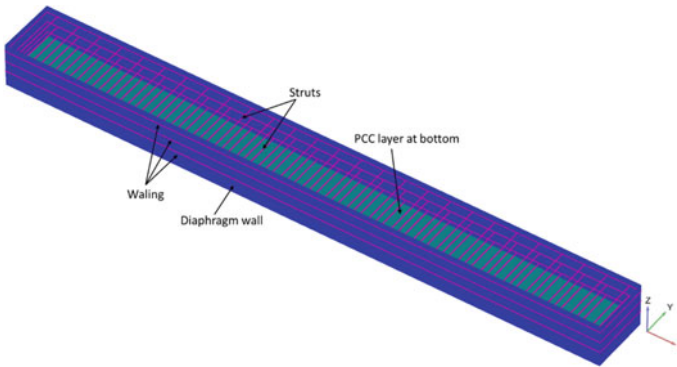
3D view of excavation portion showing diaphragm walls, waling and struts
